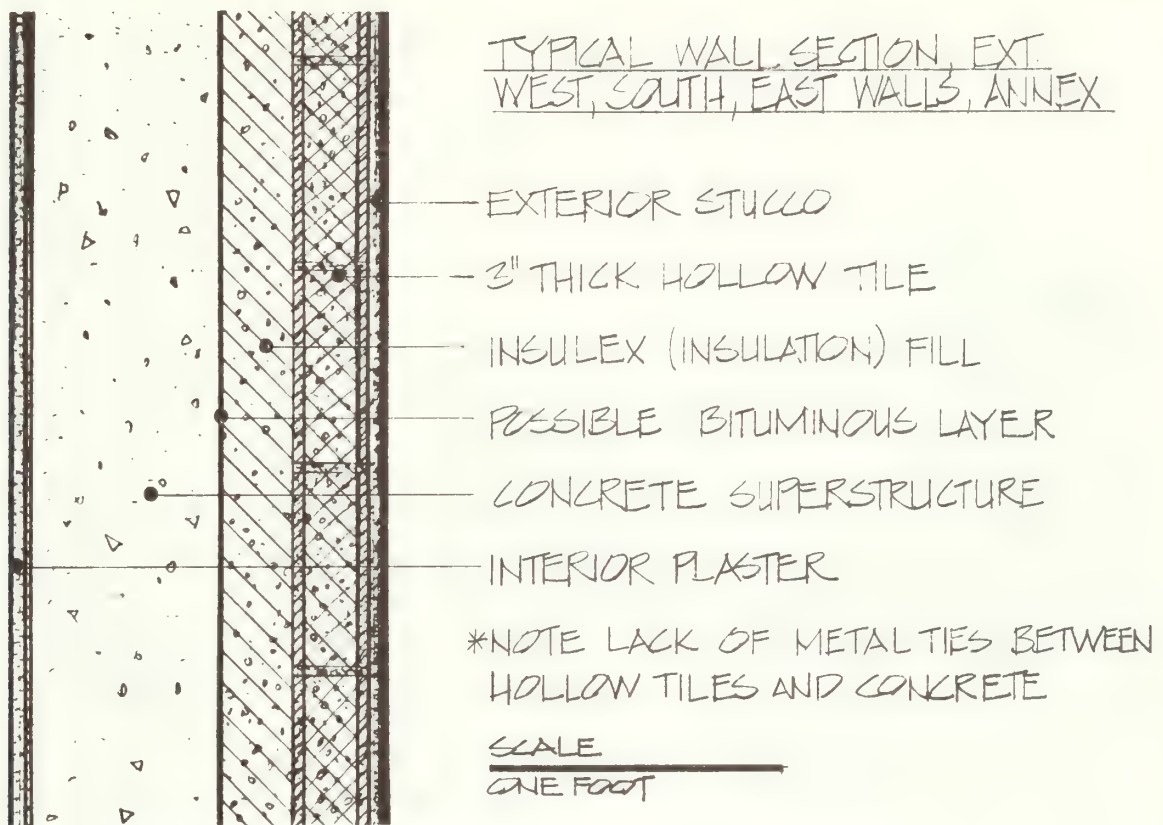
Typical Wall Section, Exterior West, South, East Walls, Annex
